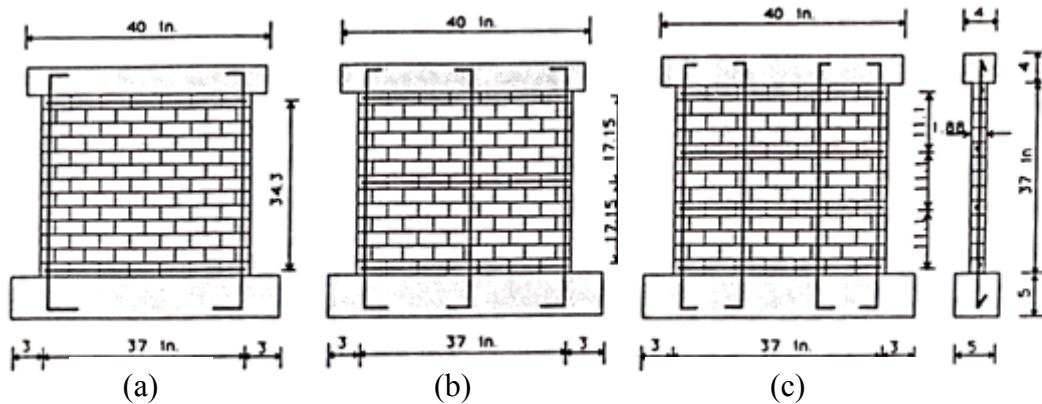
Reinforcement configuration for (a) Wall SWA, (b) Wall SWB, and (c) Wall SWC (taken from Ref. 7).
